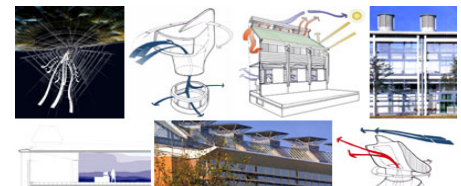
Wind towers and air scoops can provide natural ventilation and cooling for new buildings.
